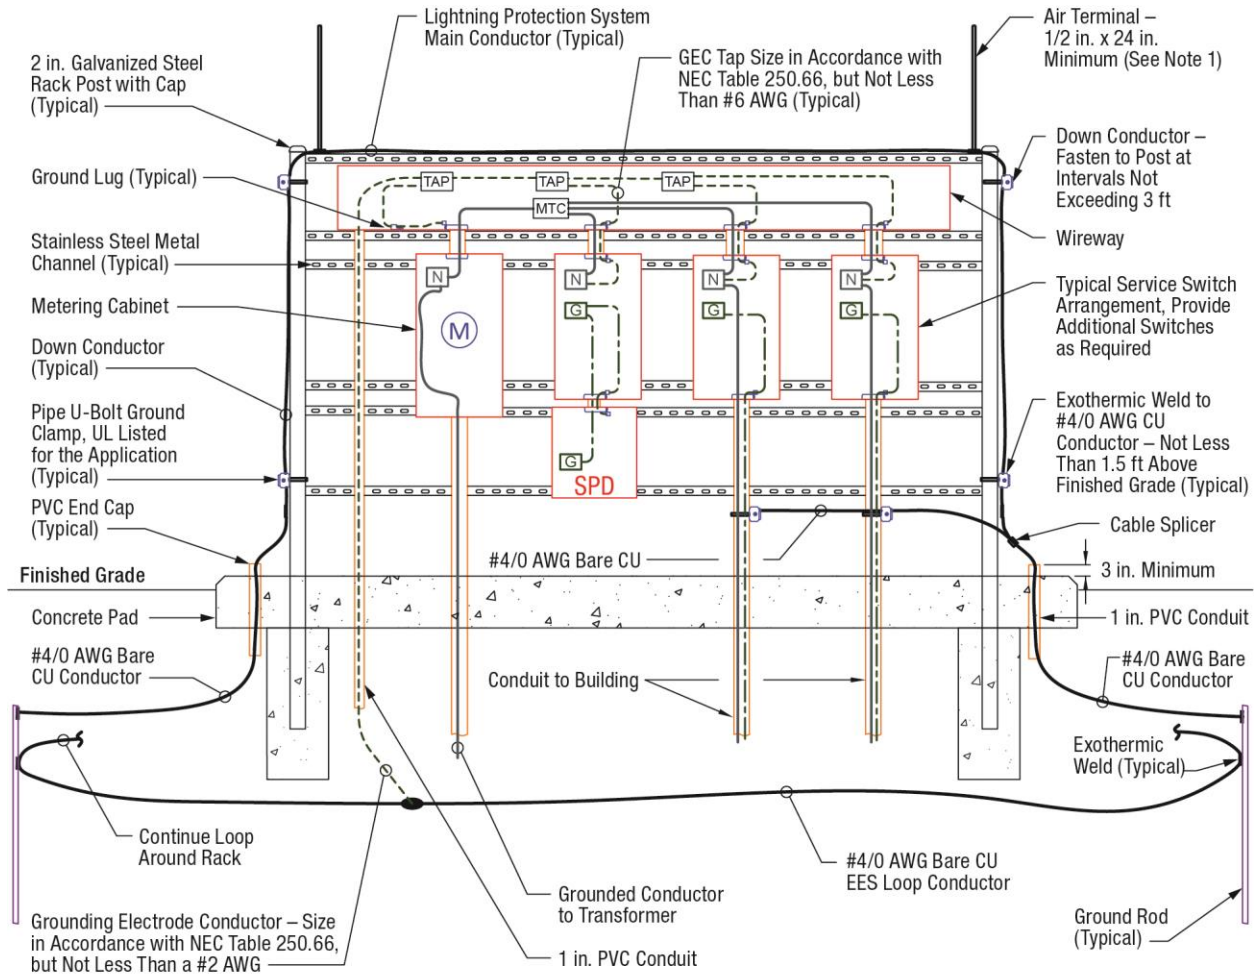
Typical ELD outdoor disconnecting means.
